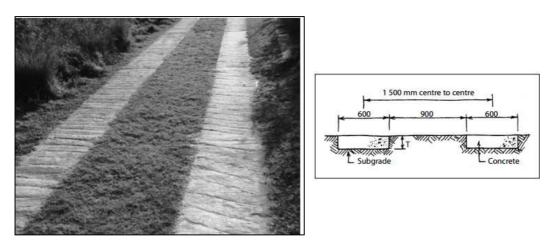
Concrete strip pavement on straight sections (Source:C &Ci)
